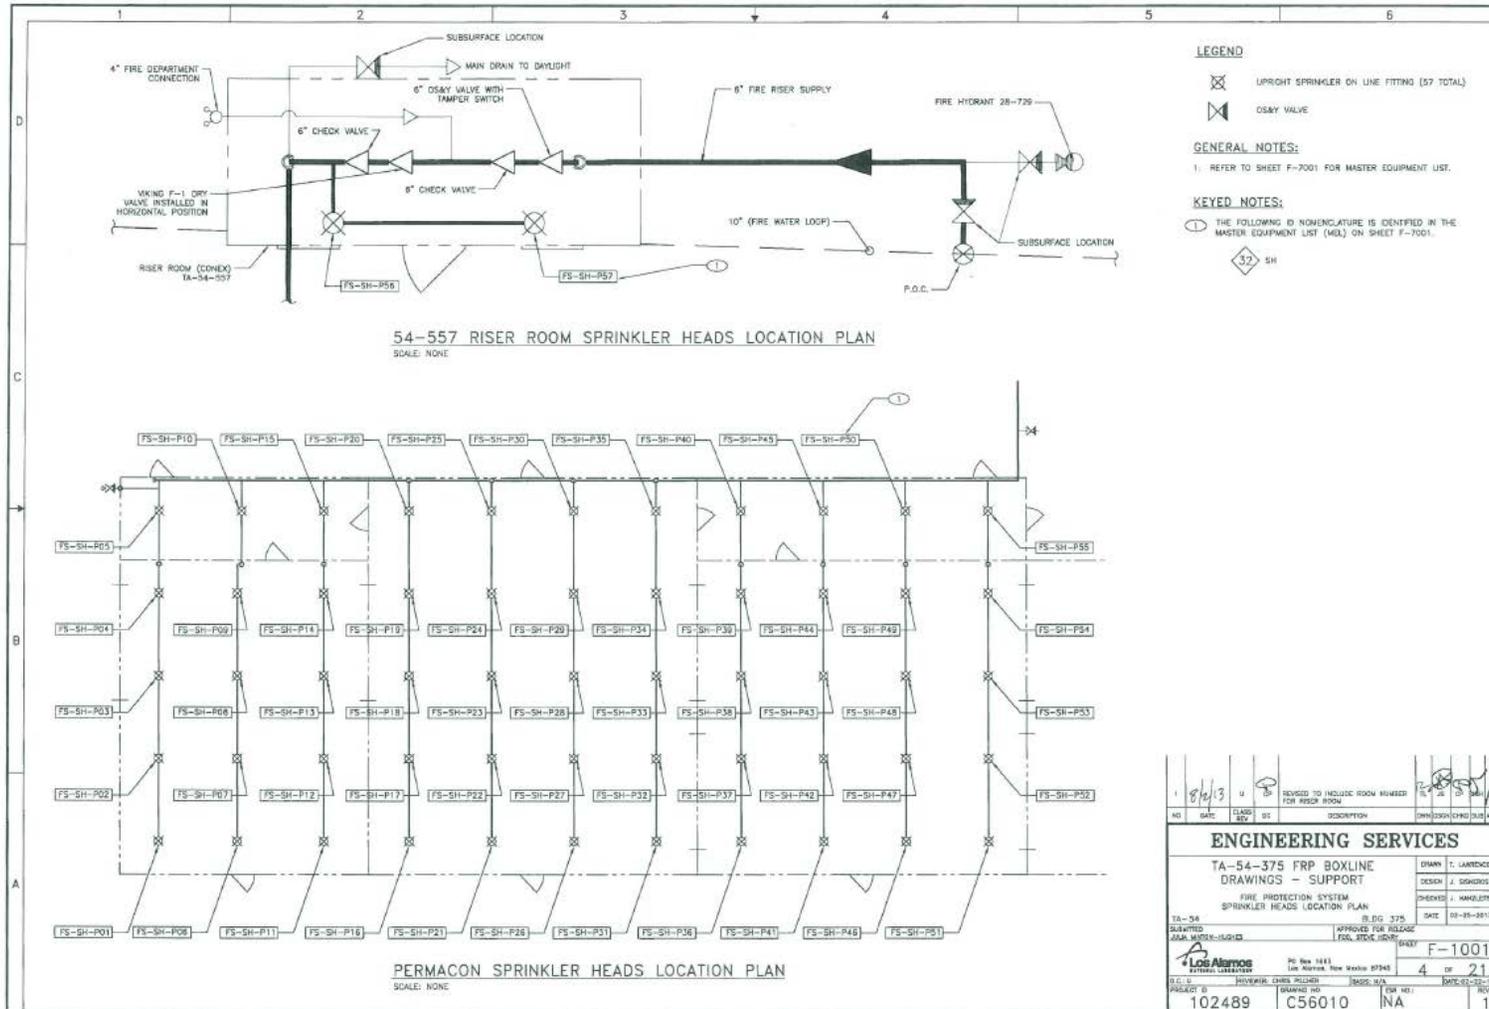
, TA-54-375 PermaCon Sprinkler Heads Location Plan
